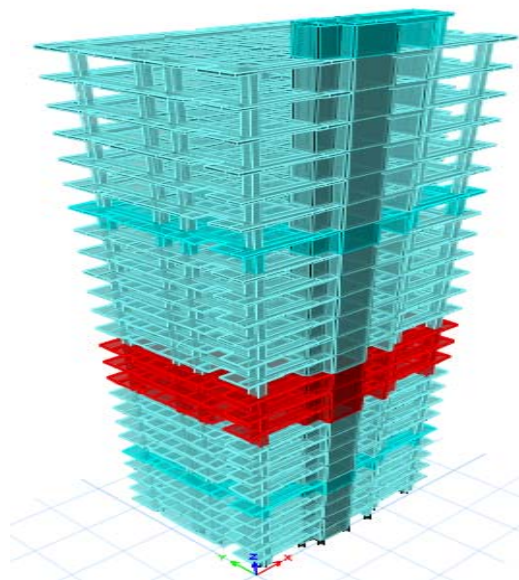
3D View of FR Tower (Fire Affected 7th, 8th & 9th Floor).
